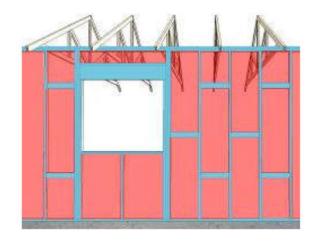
Example of Unaligned Wall and Roof Structure Requiring a Double Top Plate
